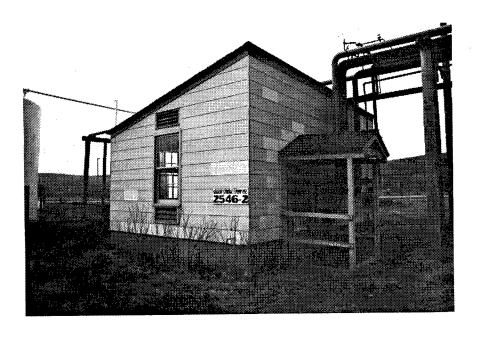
Building 2546-2: Solvent Storage and Pump House.
